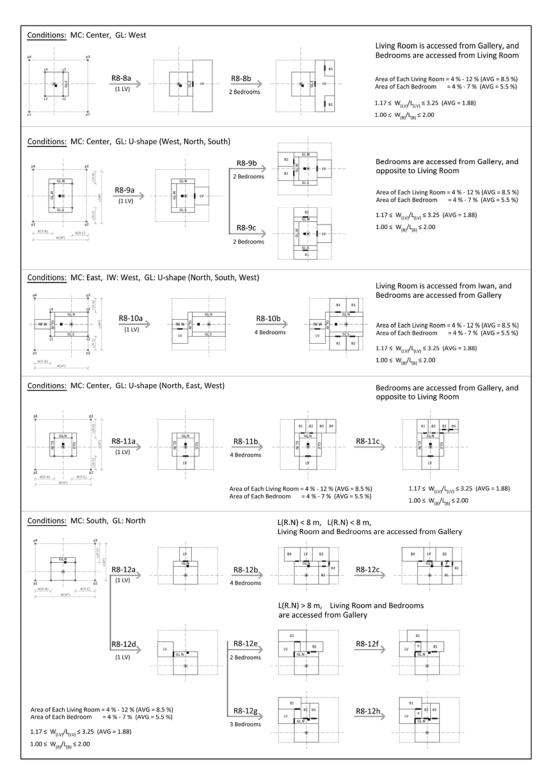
Sets of parametric rules for the configuration of living spaces and bedrooms in single-floor houses (part 3)
